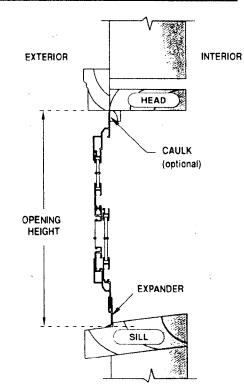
SIDE VIEW VERTICAL SECTION (Model L201 shown)
